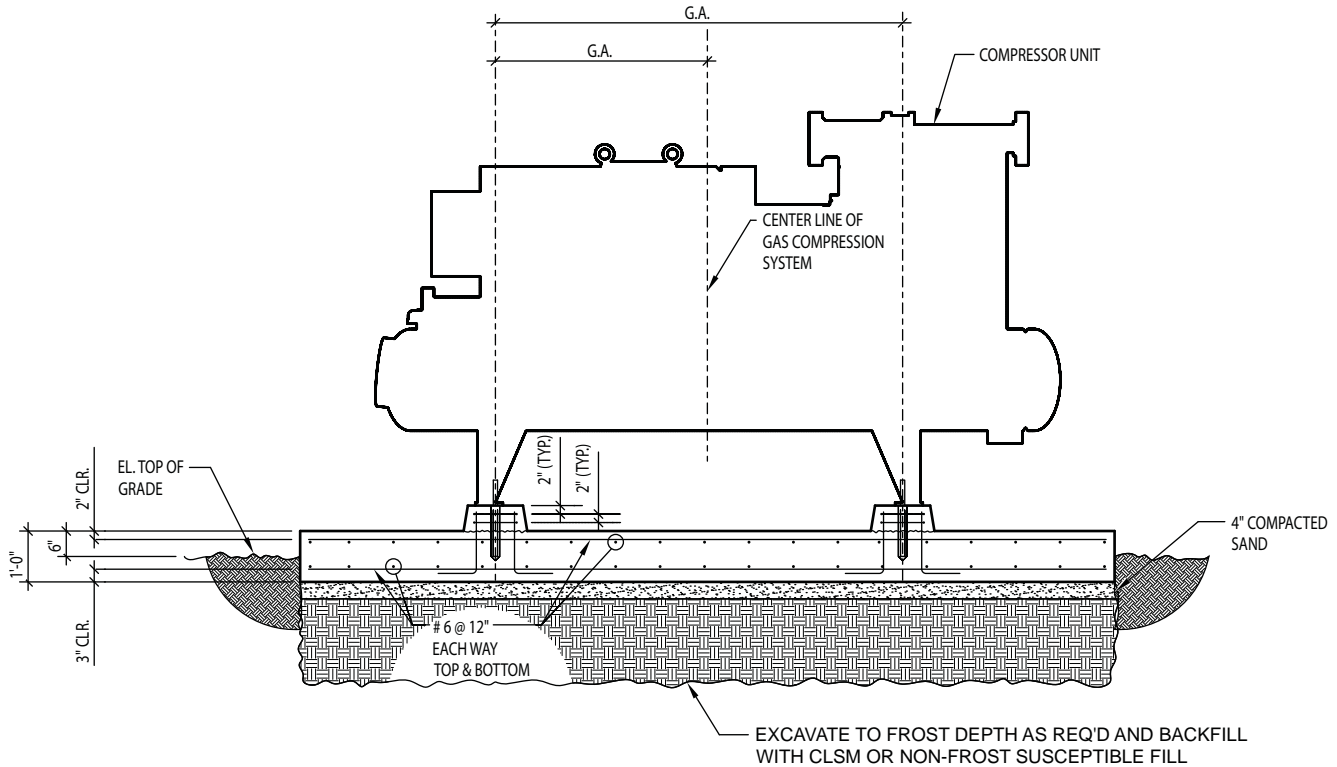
Concrete Pad with Compressor Unit Dimensions - Side View
